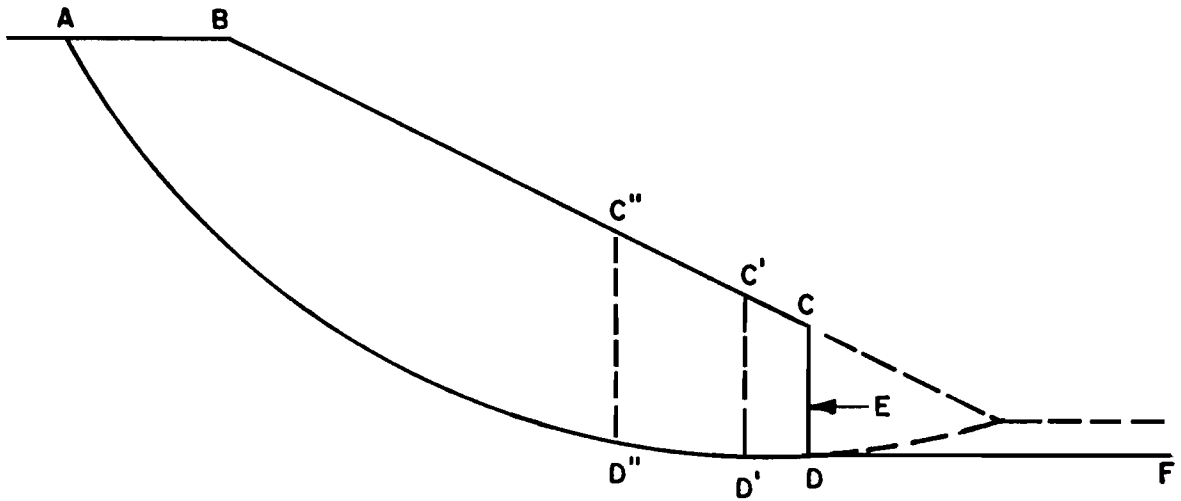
Typical slope cross section used to evaluate values of N_p' .
